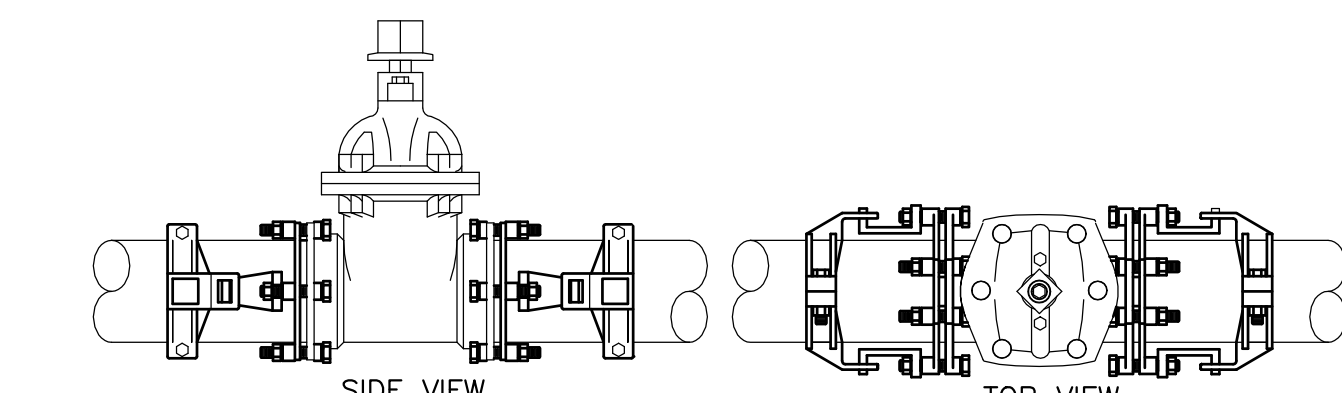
THE LS-MJ LINKS ATTACH TO THE FLANGE OF AN MJ GATE VALVE OR A FLANGED DEVICE.
